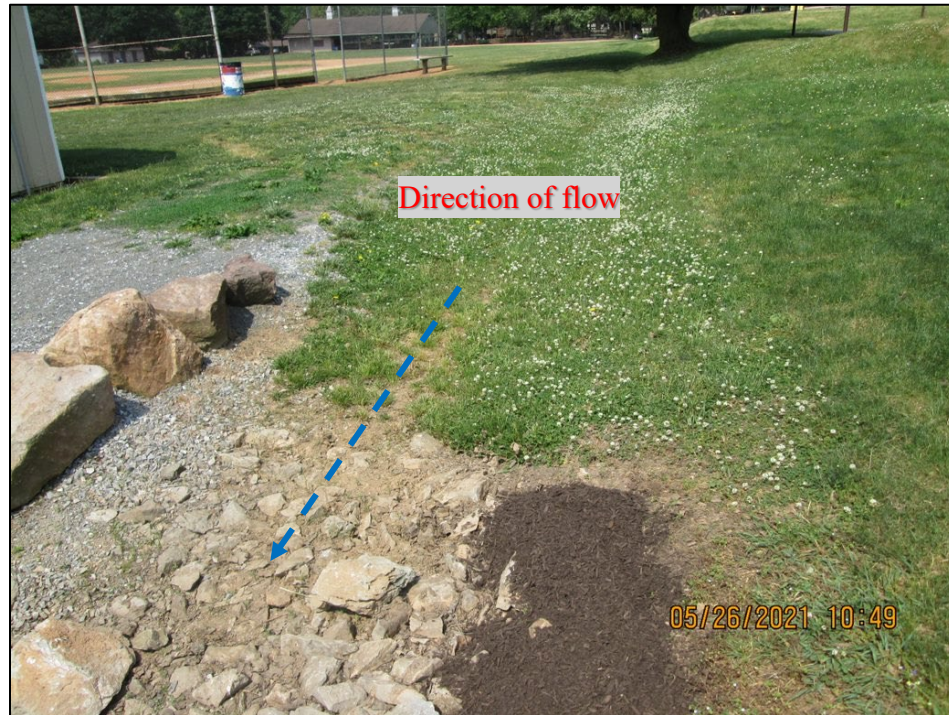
Outfall #4: (IMG_1819) View, facing north, of culvert in Photograph 25 that flows to Outfall #4.
